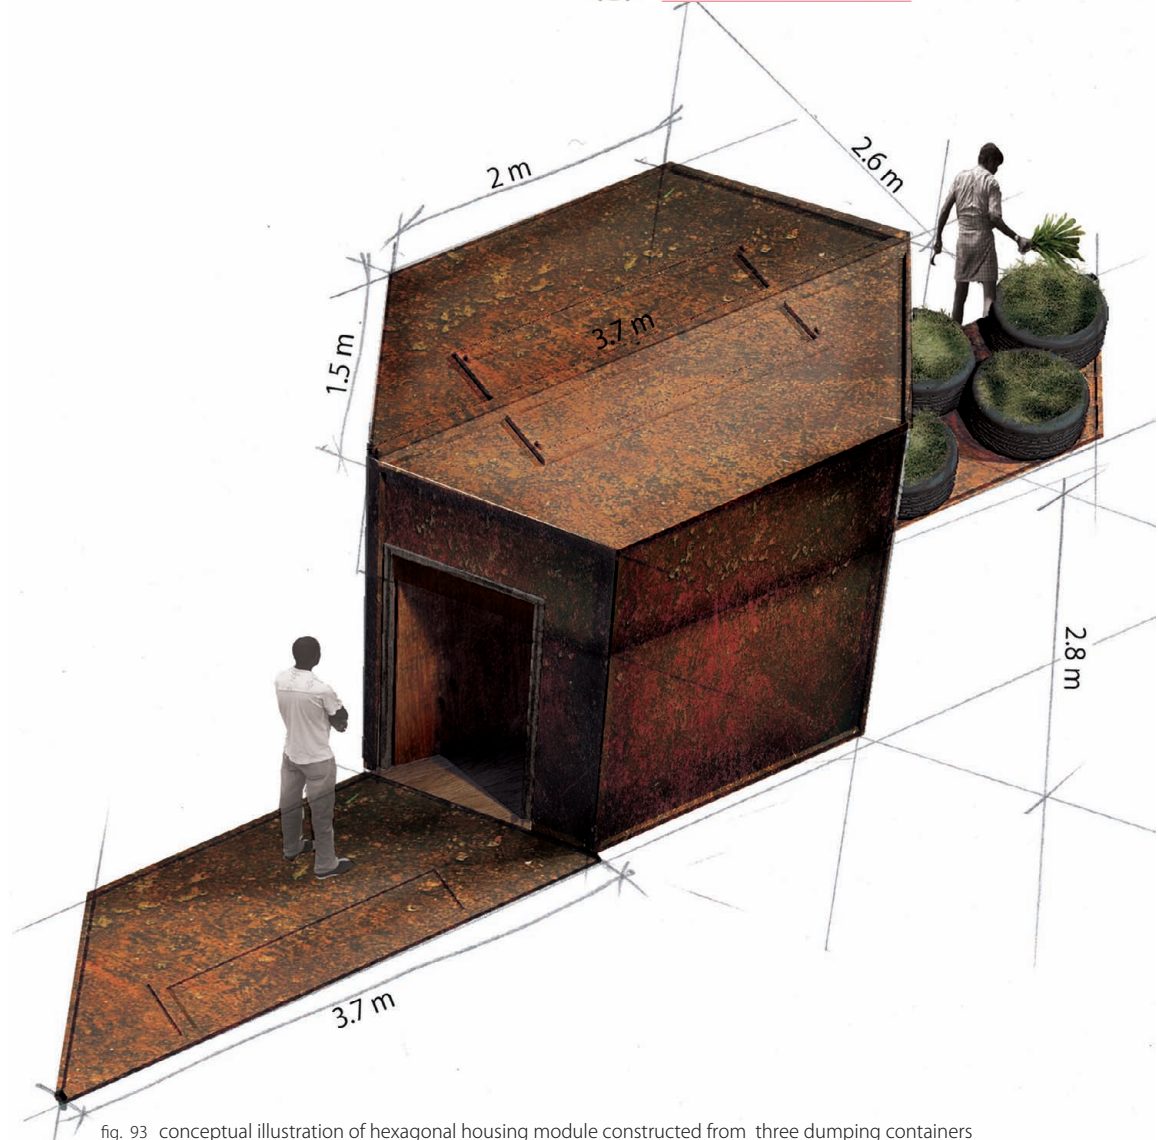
conceptual illustration of hexagonal housing module constructed from three dumping containers
